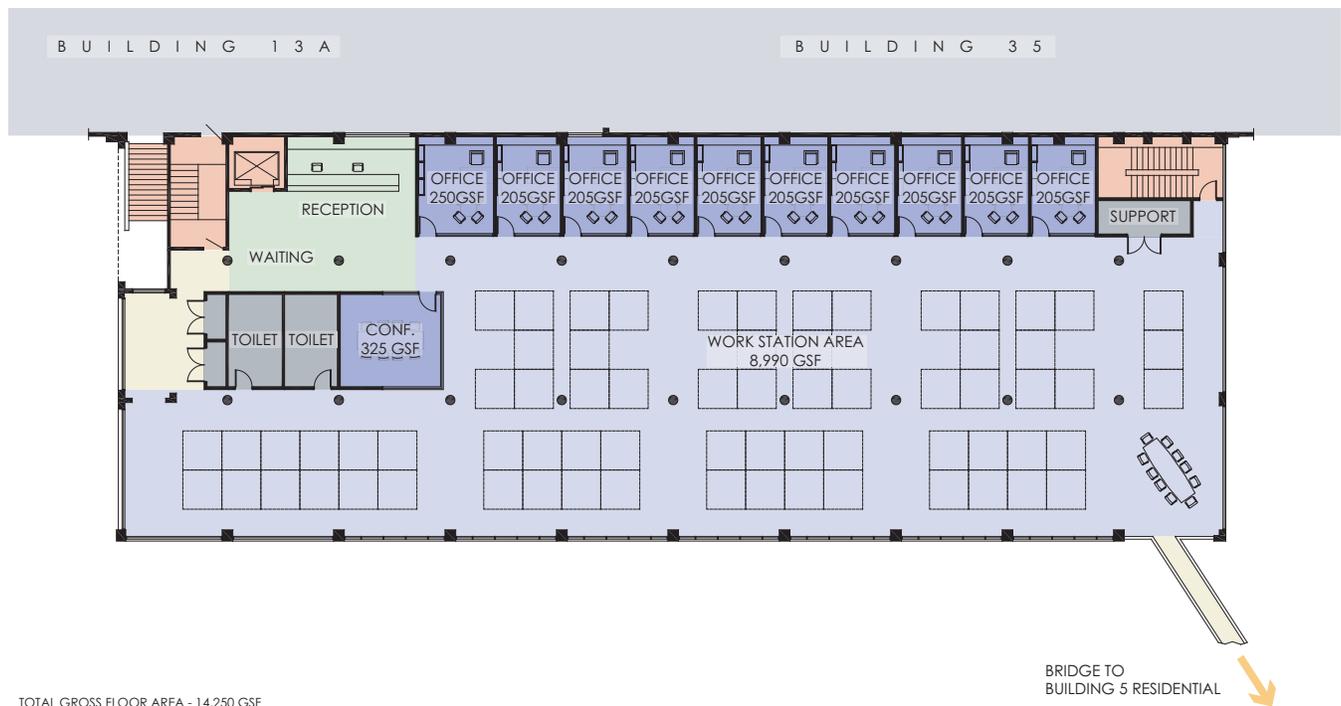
Building 8 - Potential Office Floor Plan (CJS)
